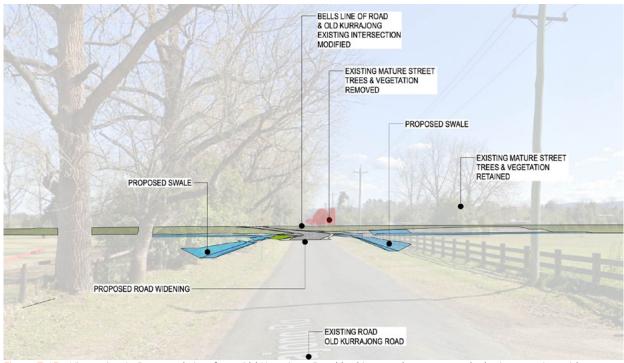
Viewpoint 4 - Proposed view from Old Kurrajong Road looking south west towards the intersection with Kurrajong Road and the bypass
